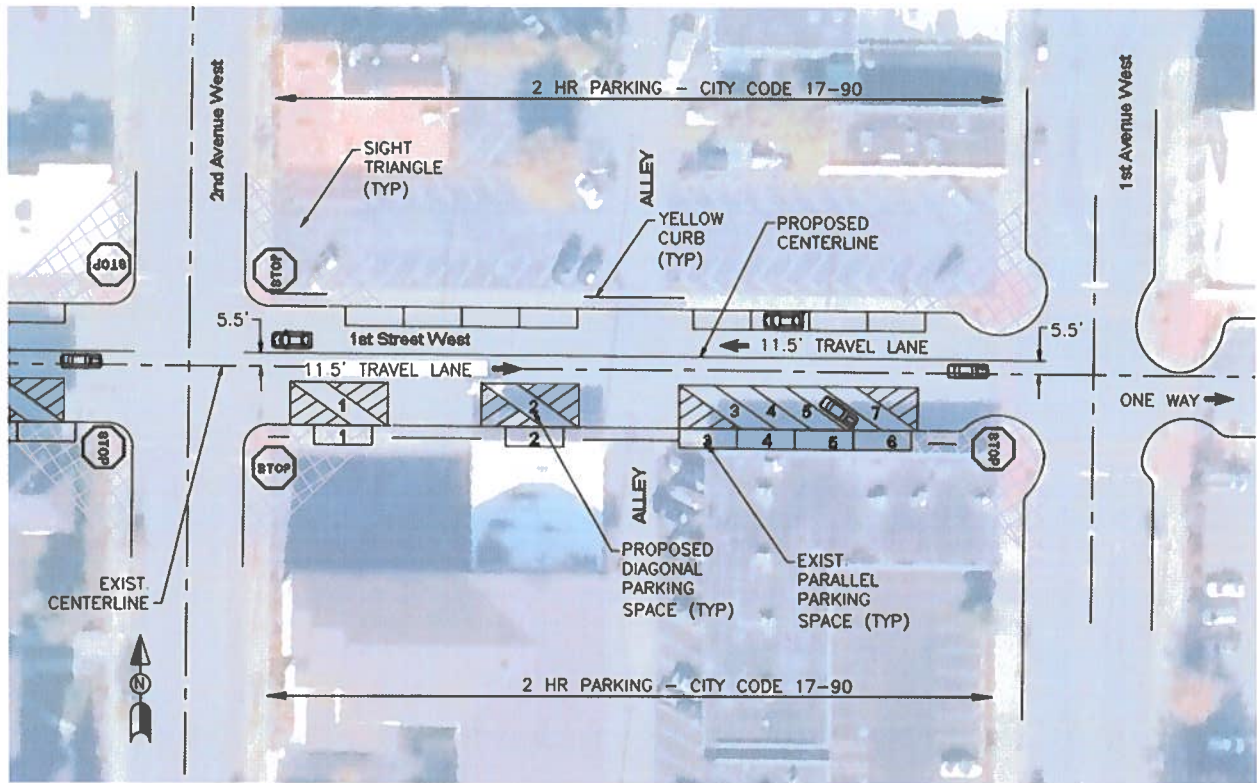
1st Street West / 2nd Ave West to 1st Ave West
